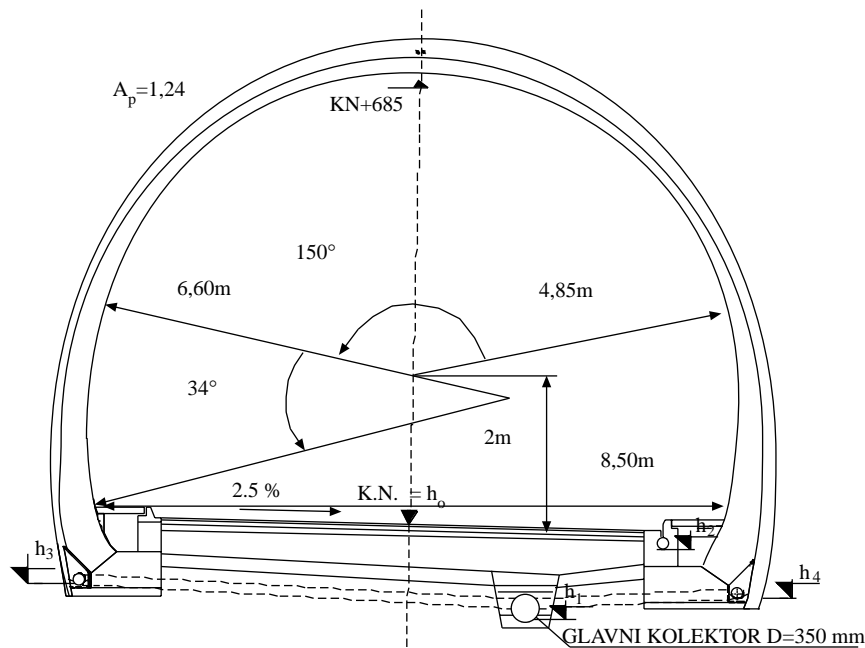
The cross-section of the tunnel on the road D-1 near town of Split in Croatia.
